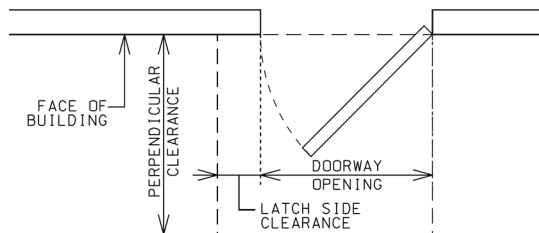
Maneuvering Clearance at Manual Swinging Doors & Gates
